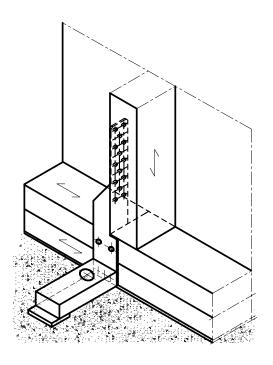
Typical installation of a two-piece hold-down (bent) with a pressure piece under the base plate
